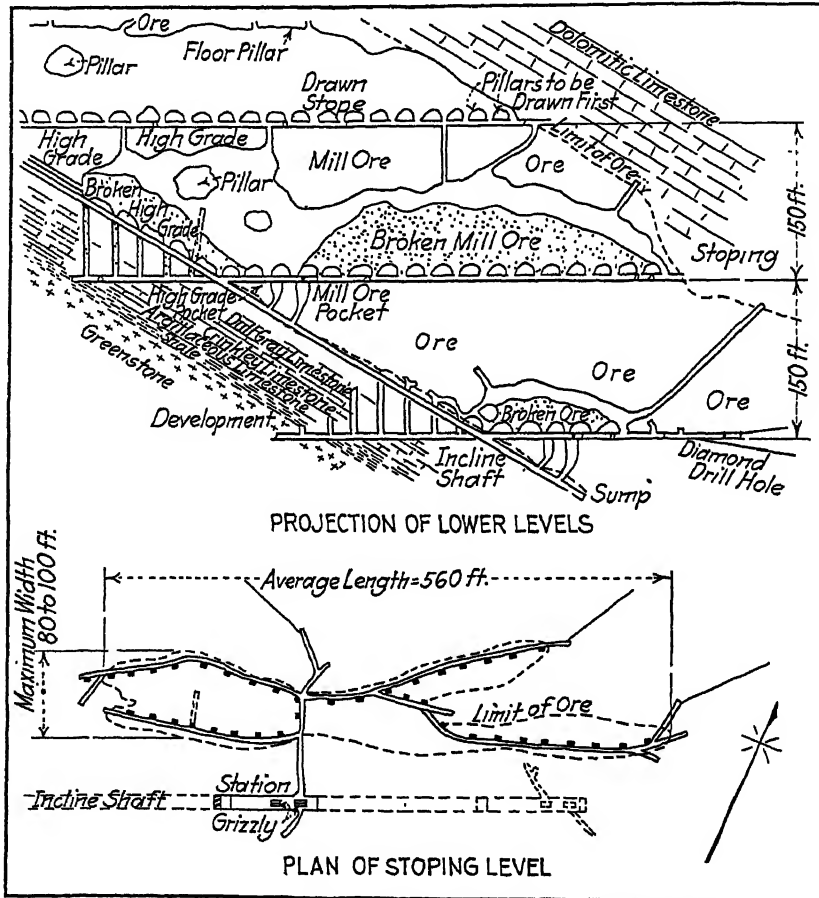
PROJECTION AND PLAN SHOWING GENERAL MINING METHODS.
